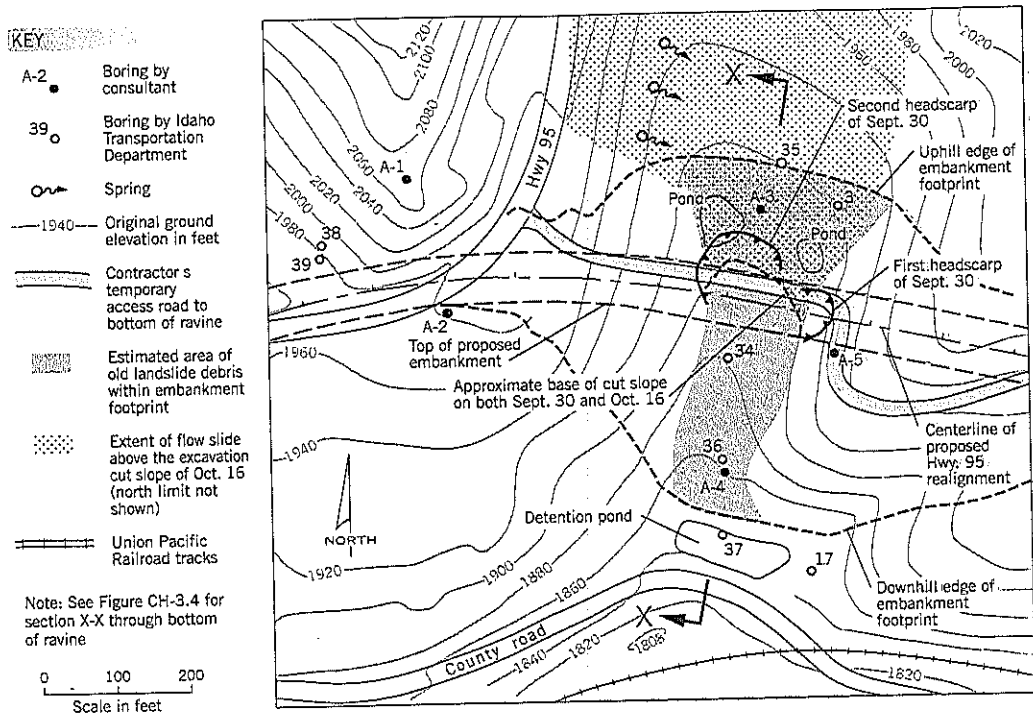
Bonners Ferry Slide. Site plan.
